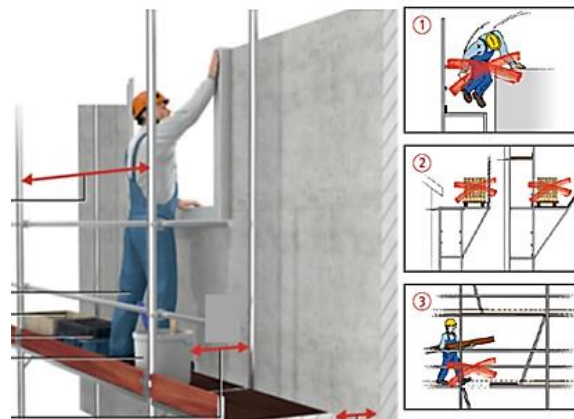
Efficient and safe construction of building facades on the EU construction market.
